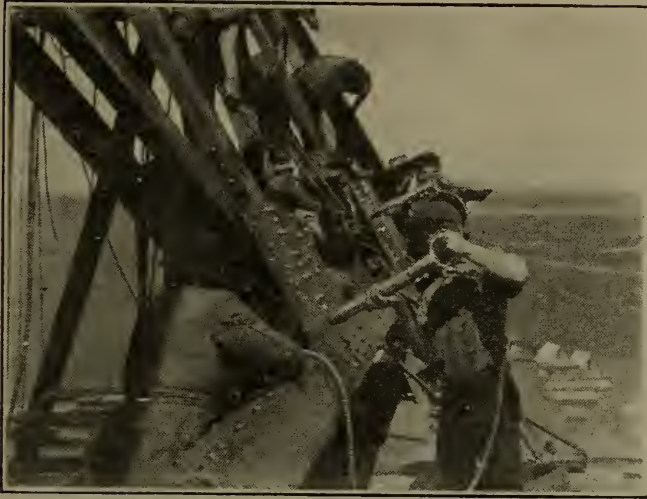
Riveting together from slings the head frame of a deep mine shaft.
